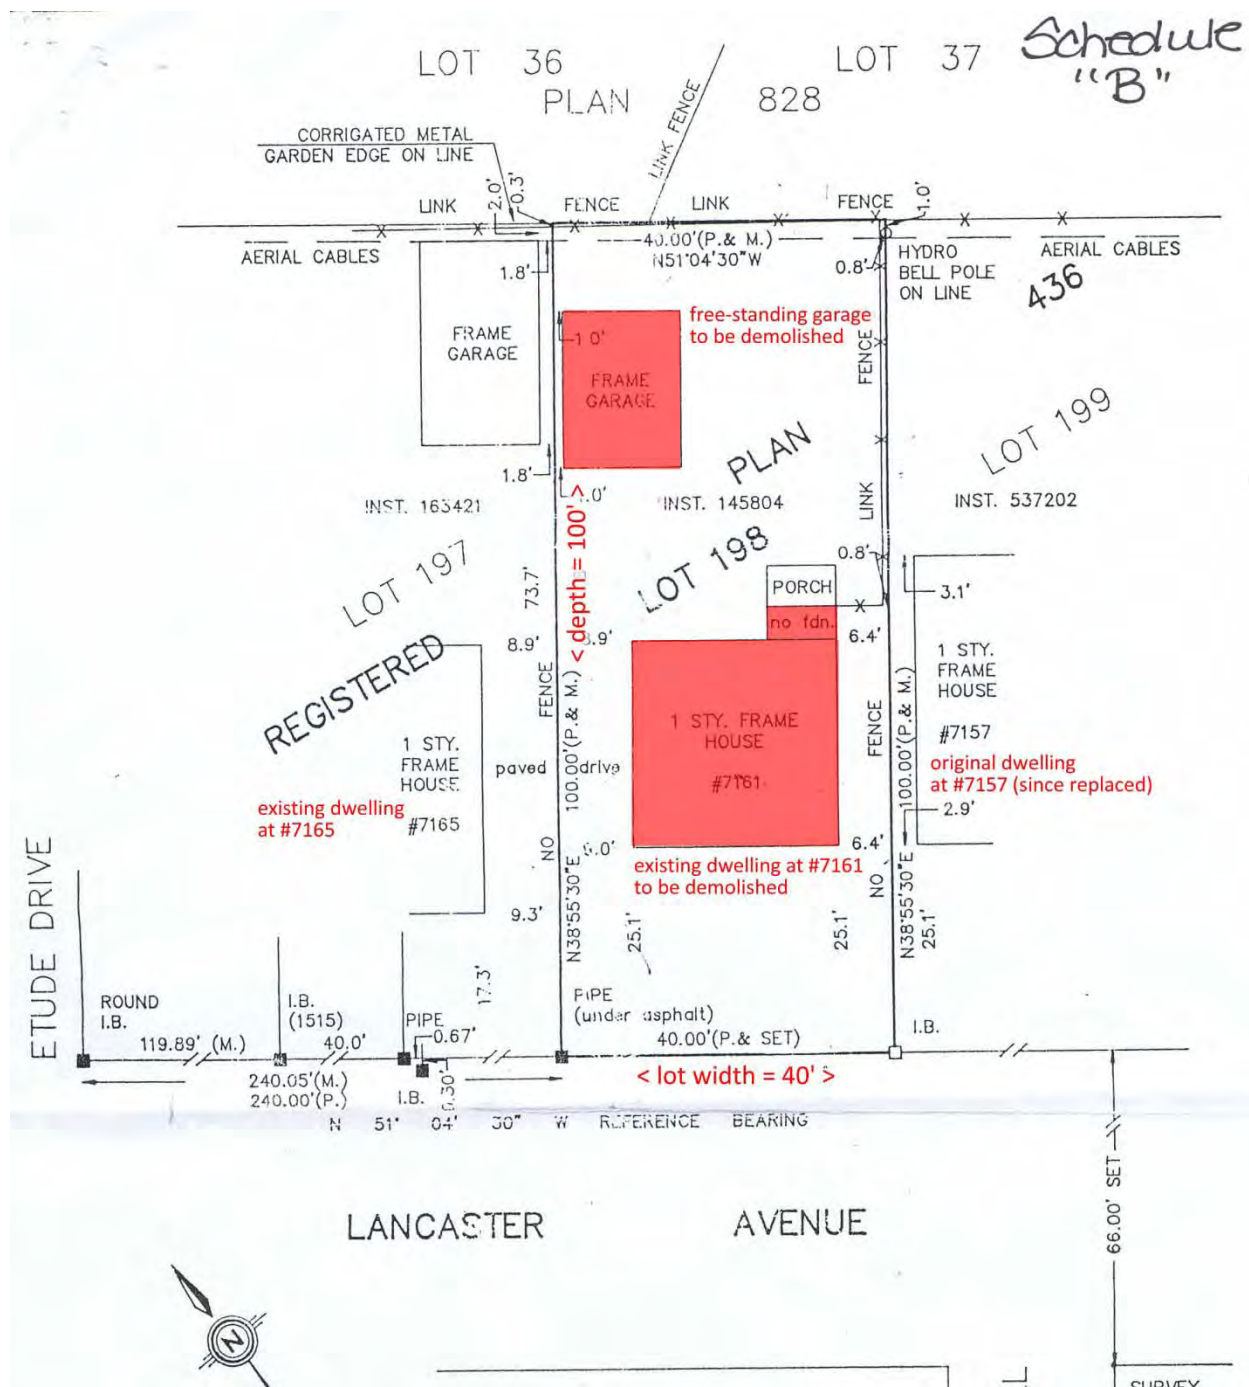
Cropped section of Plan of Building Survey of Lot 198 (1990) showing the existing buildings, driveway and fencing.
